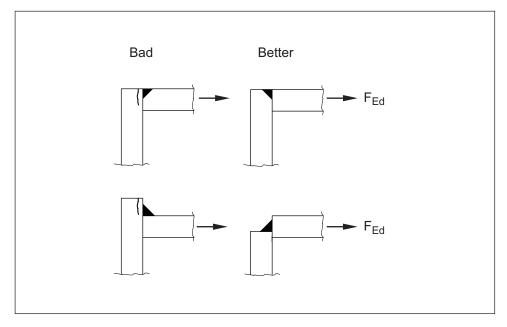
Corner joints in plated structures. Design practices to reduce the risk for lamellar tearing (does not concern 'corner joints' of structural hollow sections) [14]
